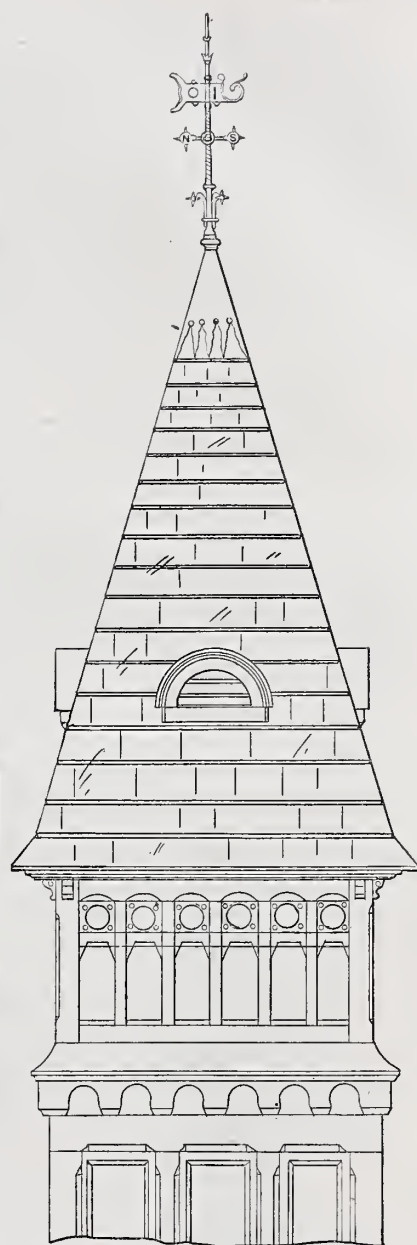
Elevation of Upper Part of Tower.—Scale, 1/4 Inch to the Foot.
